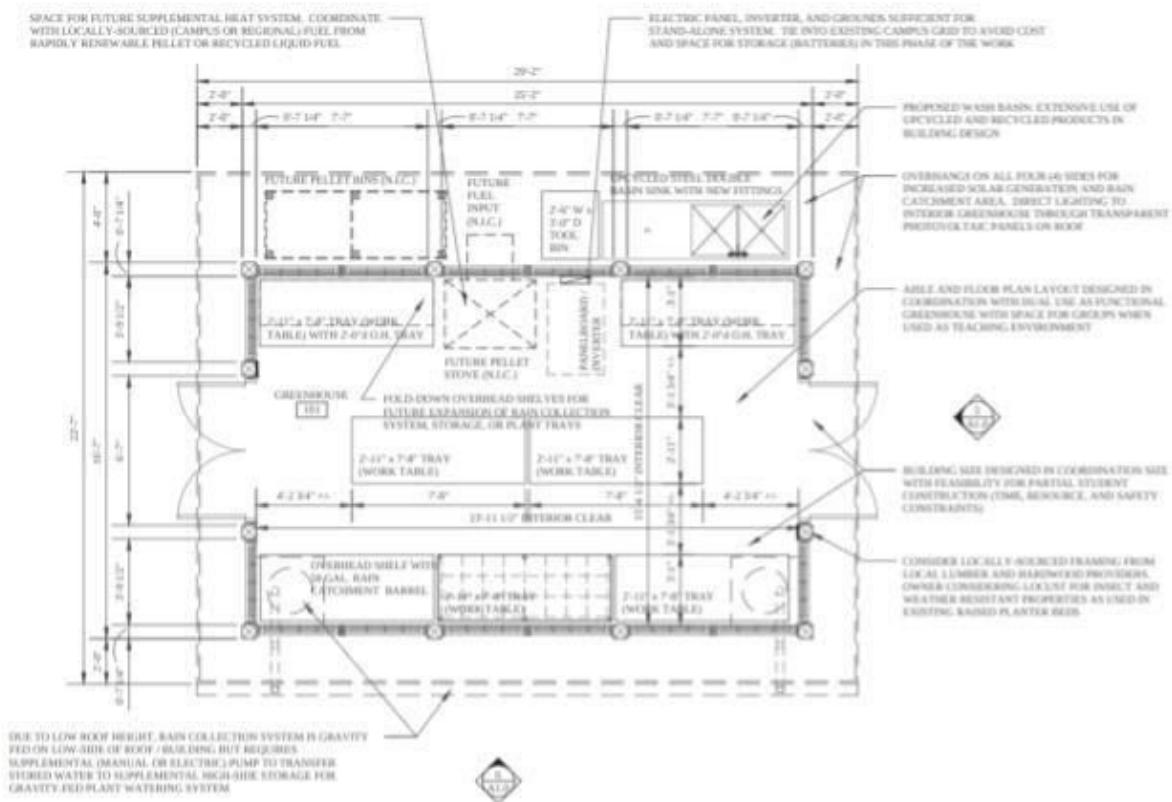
Architectural plan excerpt depicting proposed greenhouse interior. Student A worked in collaboration with a professional architect to develop detailed plans and a rough budget for a funding proposal.
